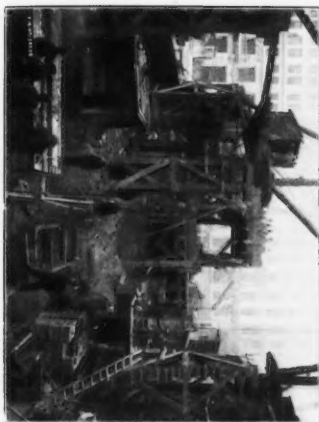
FEBRUARY 16TH, 1907, PLACING THE LAST CAISSON.
